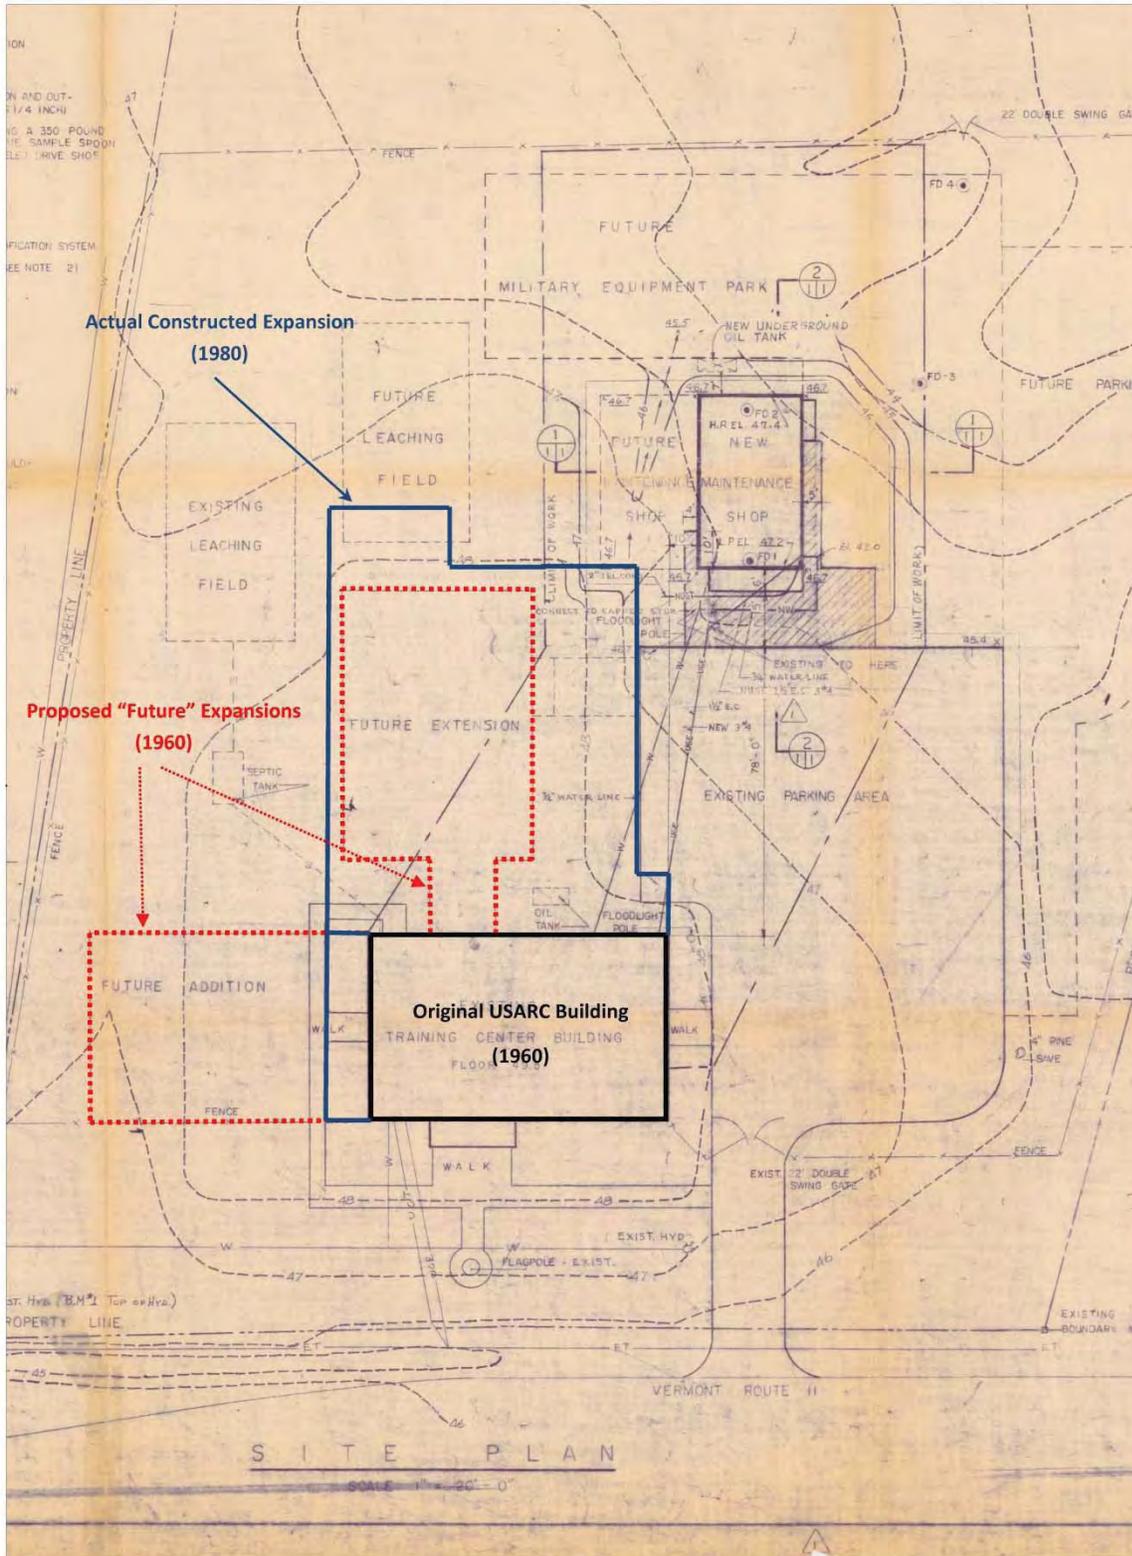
Original (1960) site plan for the Chester USARC, highlighting the proposed extensions and showing the actual expansion as constructed.
